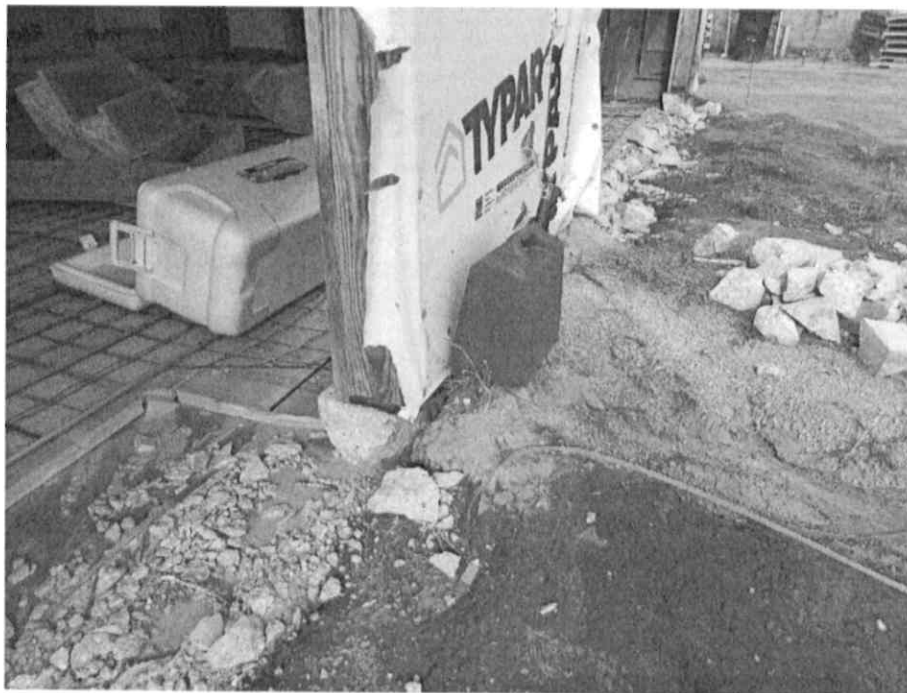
View of the exterior wall at east elevation of garage between the overhead doors. See also next photo.
